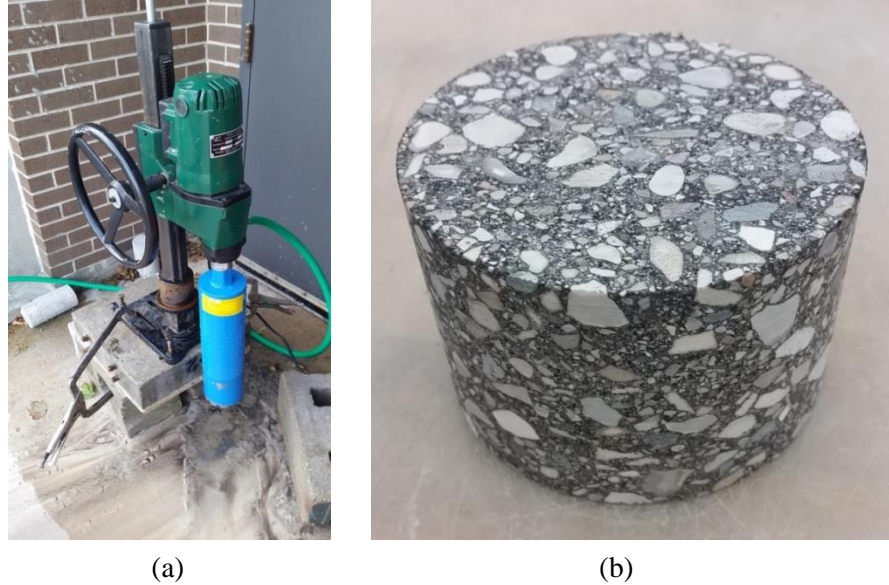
Methods for Core Drilling (a) Core Drill (b) 101.6 mm diameter by 50.8 mm Thick Specimen
